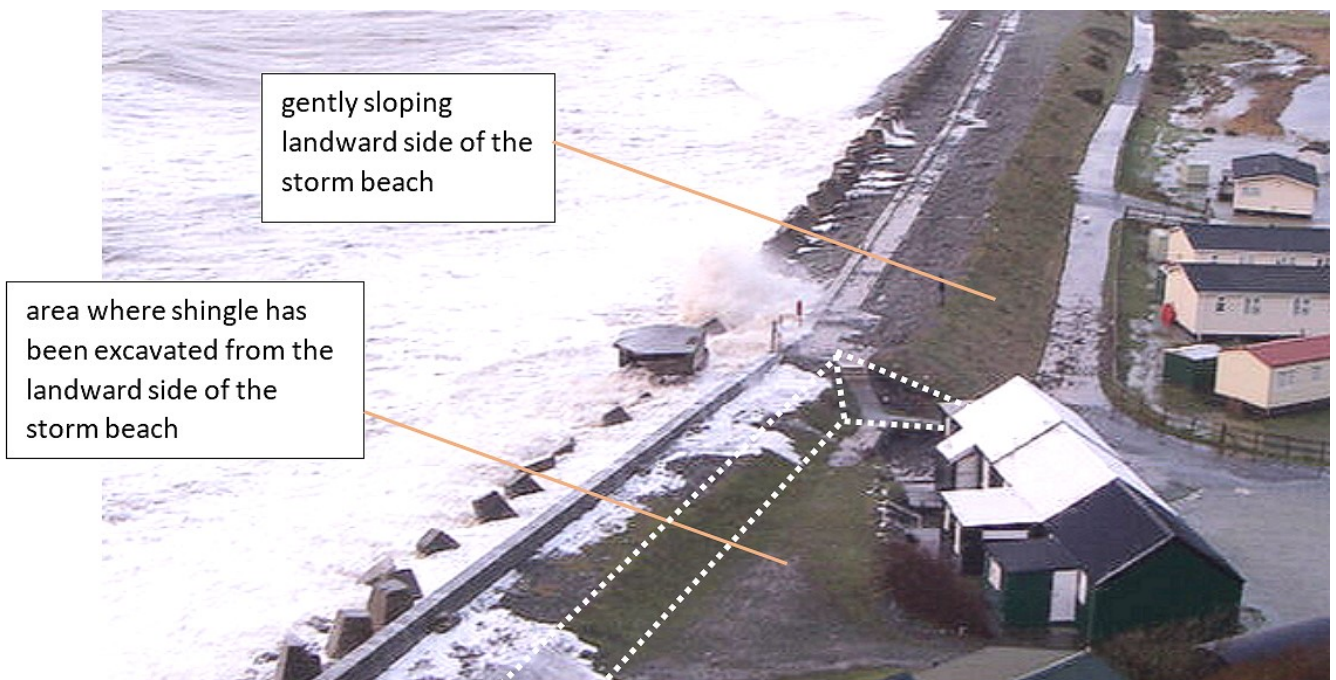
Friog corner under storm conditions, before reconstruction of the sea wall.
